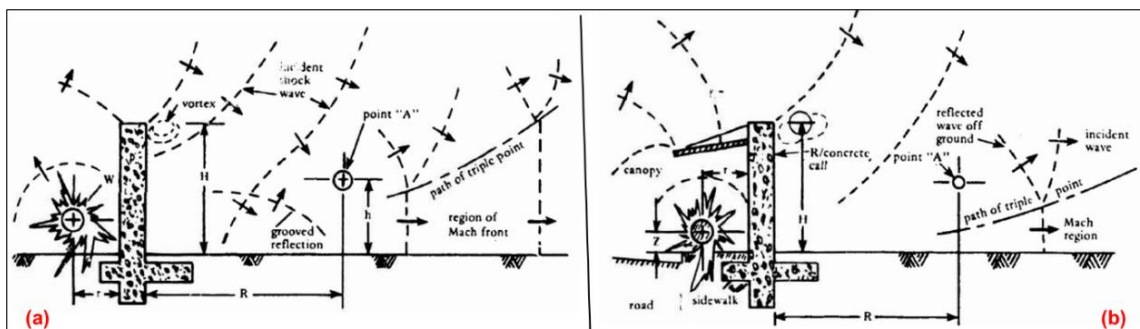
Blast phenomenon behind wall a. cantilever wall b. canopy wall [12]
